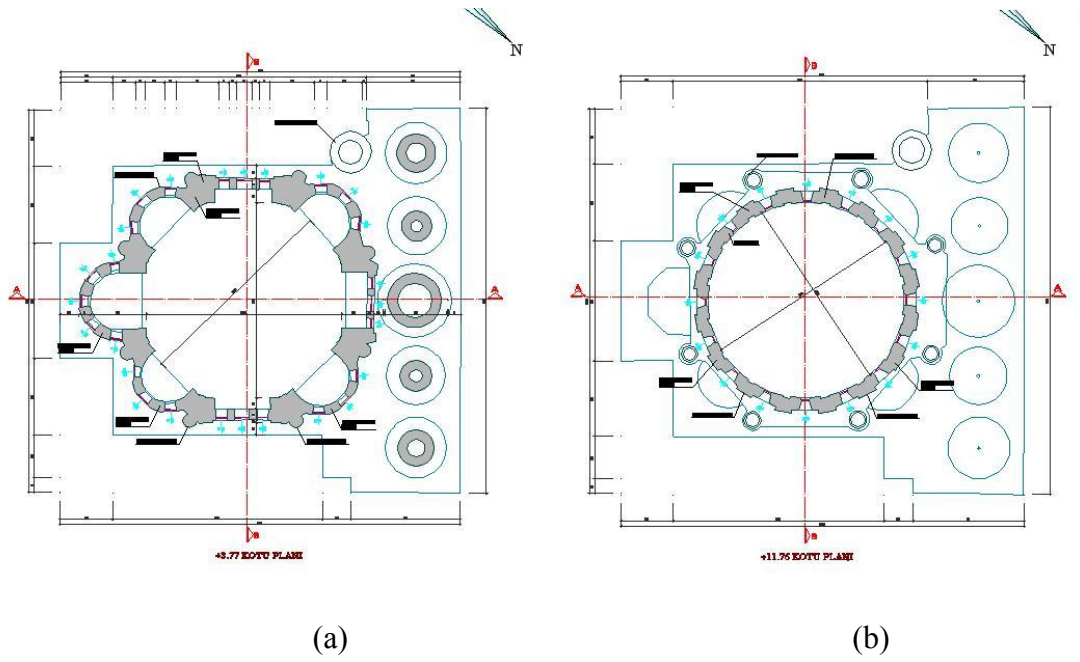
Upper level plan views; a) +8.77 height, b) +11.76 height
